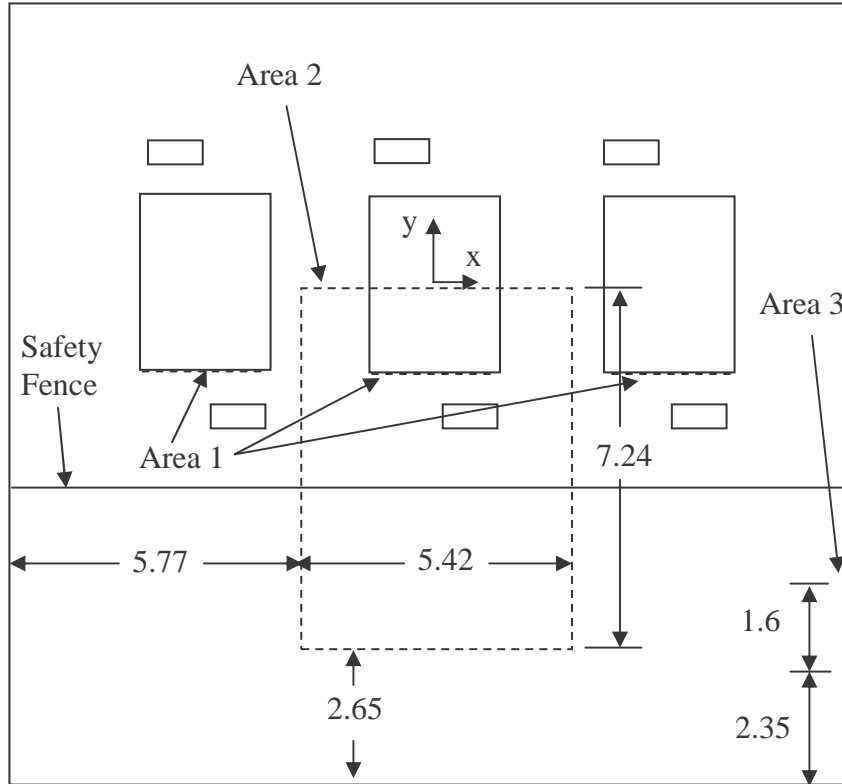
Plan view of valve hall showing the three areas for IT testing (all dimensions in meters)
